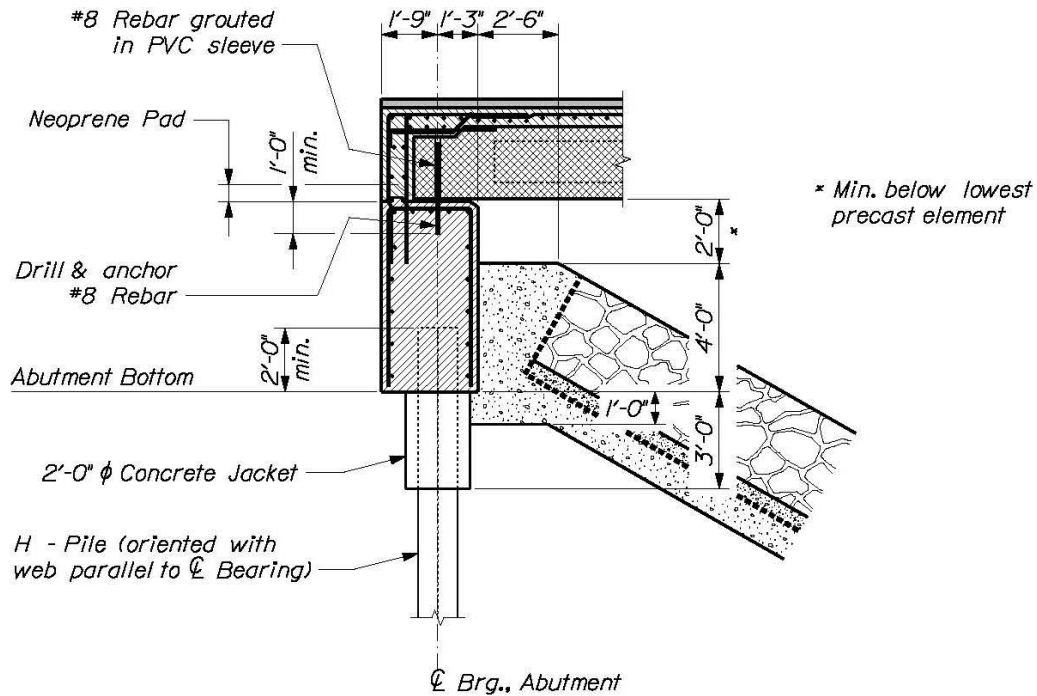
Fixed Pile Head, Full Integral Abutment Details-Steel Superstructures
